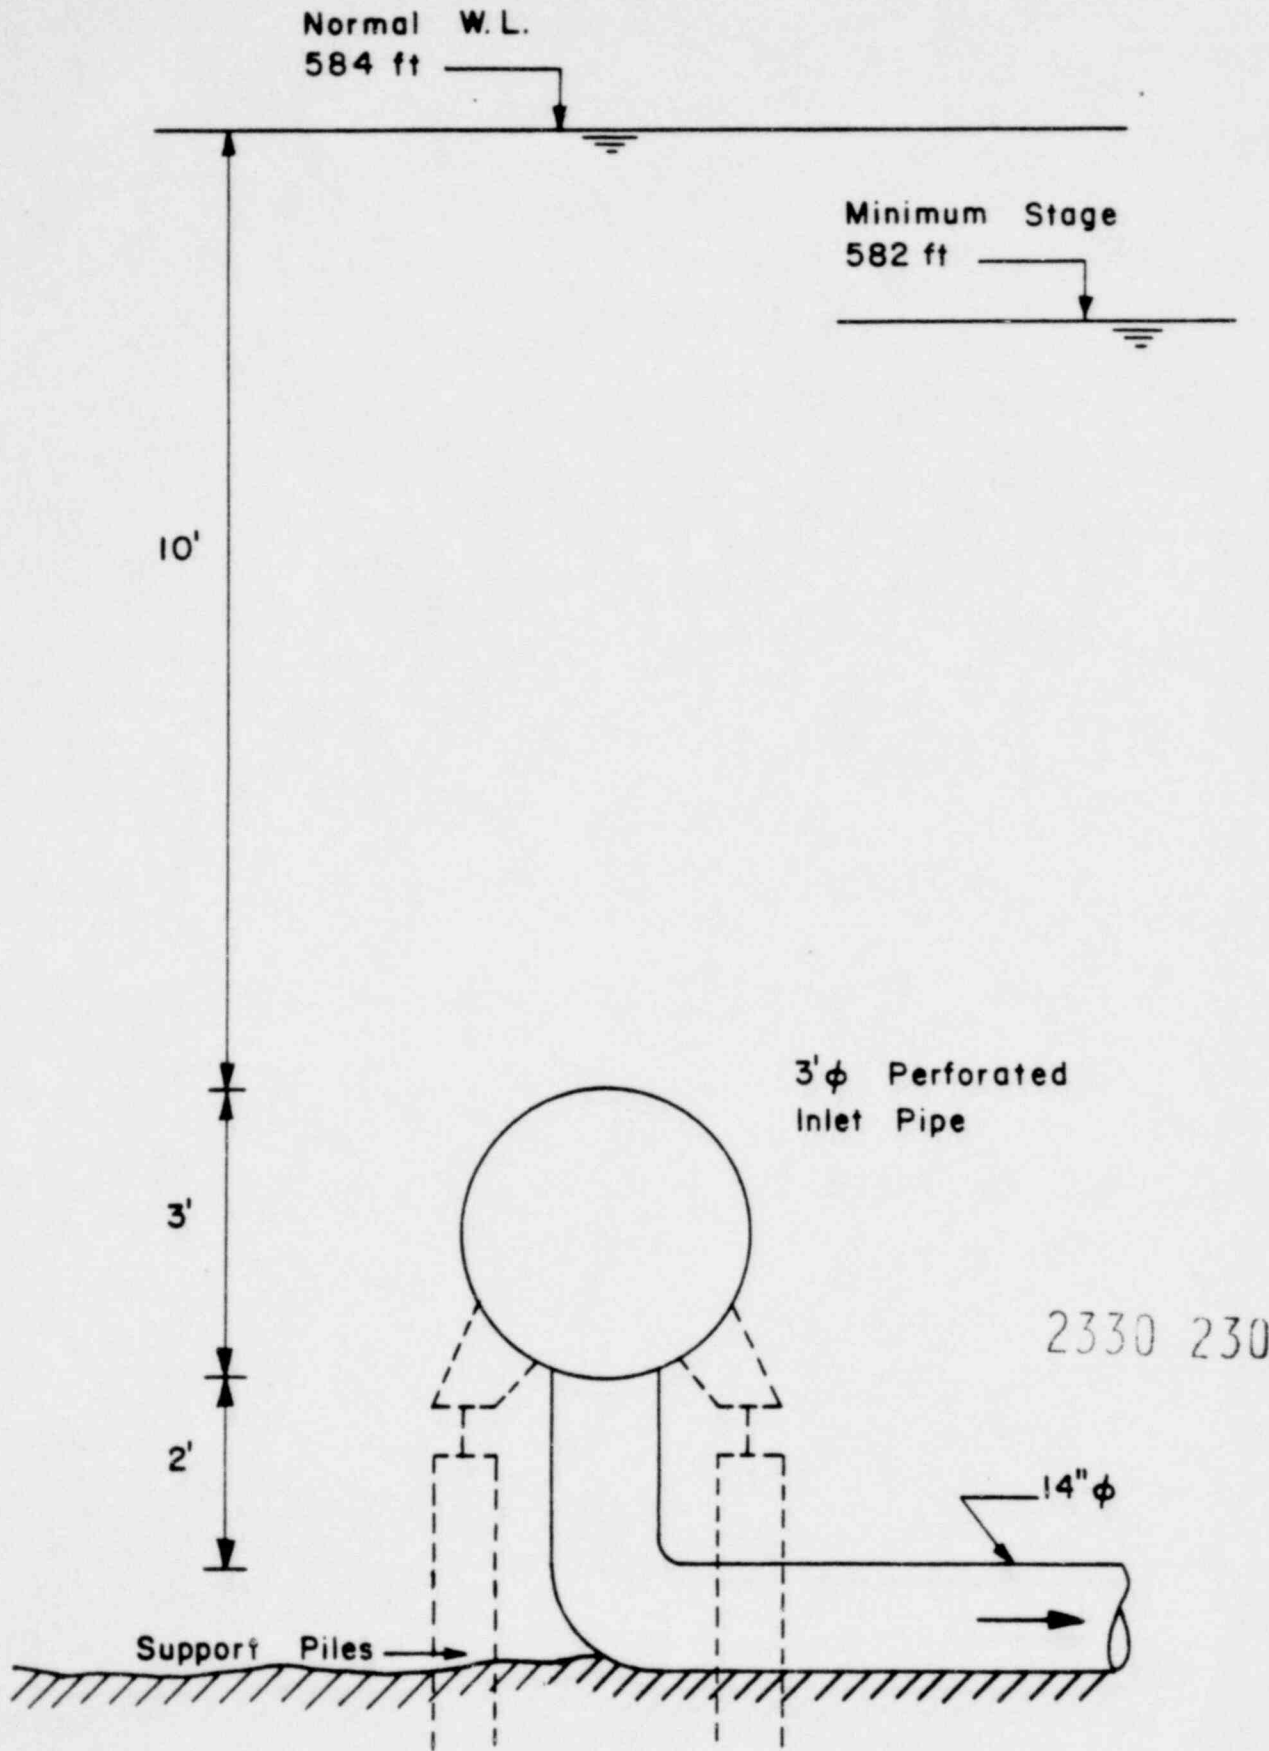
Layout of field test; cross-section at the perforated pipe inlet
